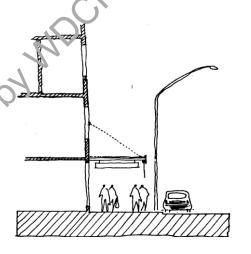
Awning design – suspended steel box section type with a minimum soffit height of 3.2m
